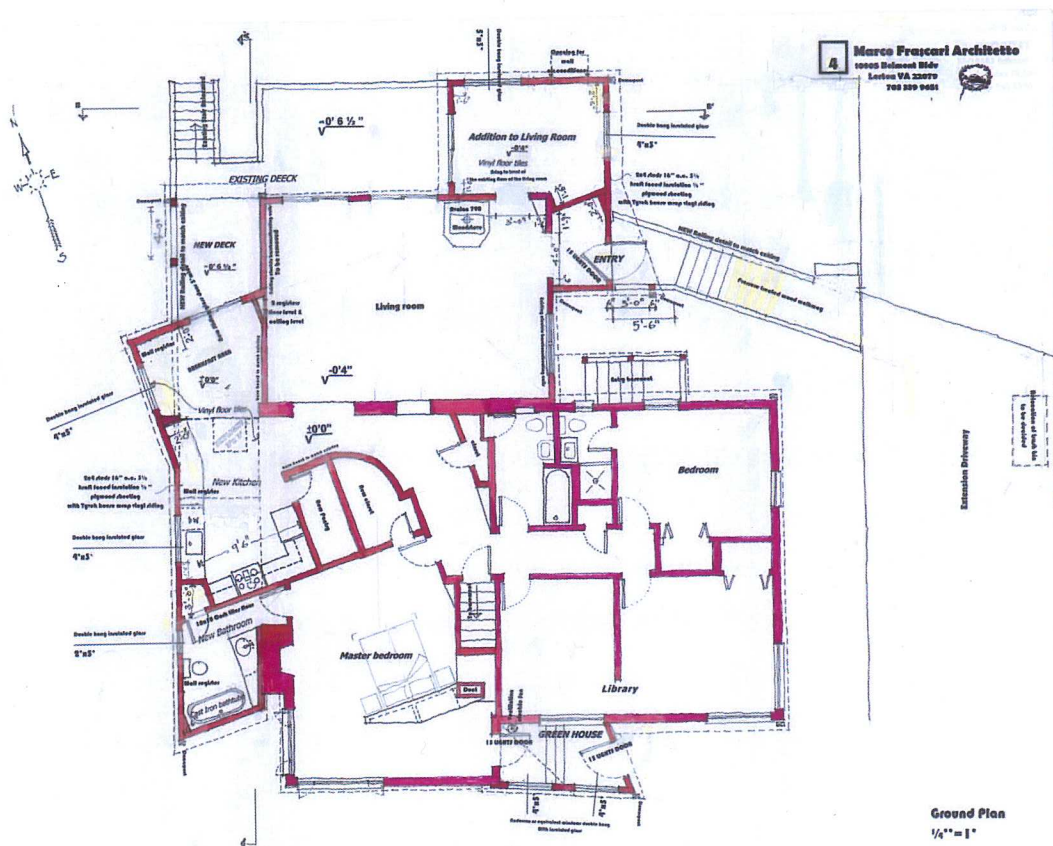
Villa Rosa, Working Drawing, Plan
